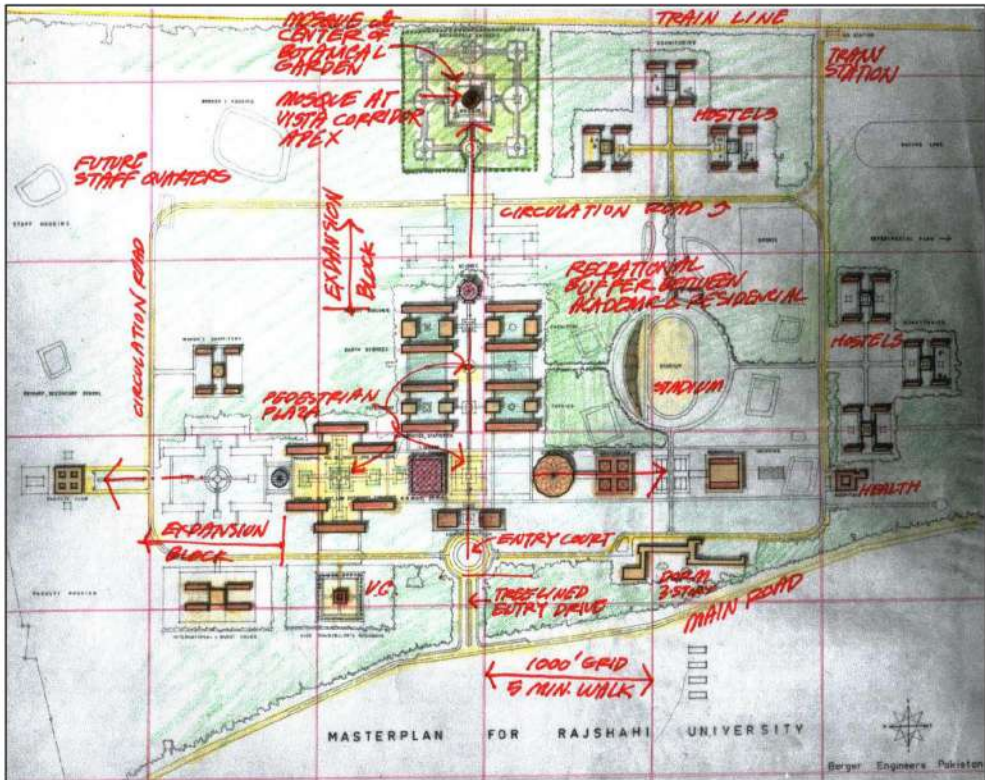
Campus Plan Analyzed by Rafique Islam, Architect, Arizona, USA.
